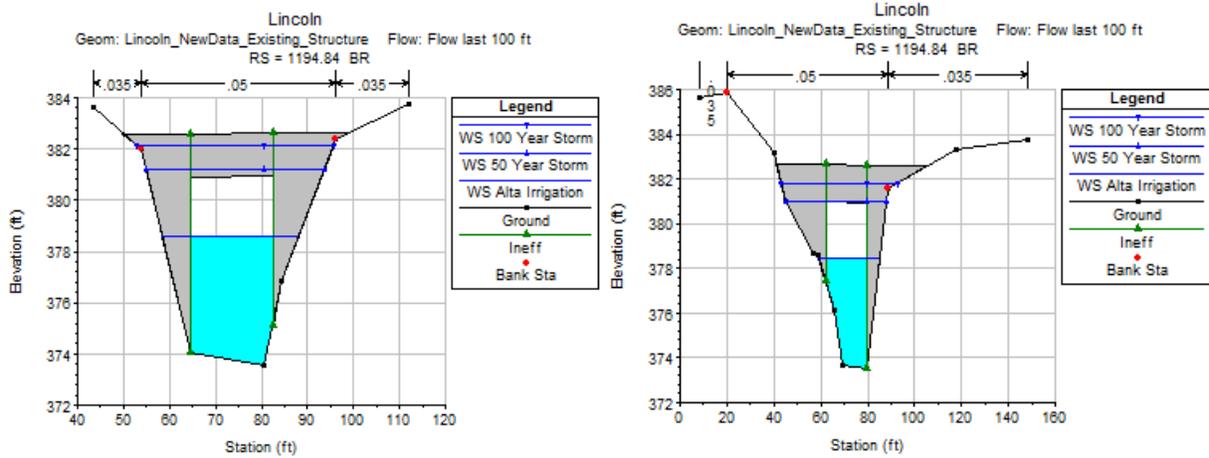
Existing Lincoln Avenue Bridge HEC-RAS Cross Sections
